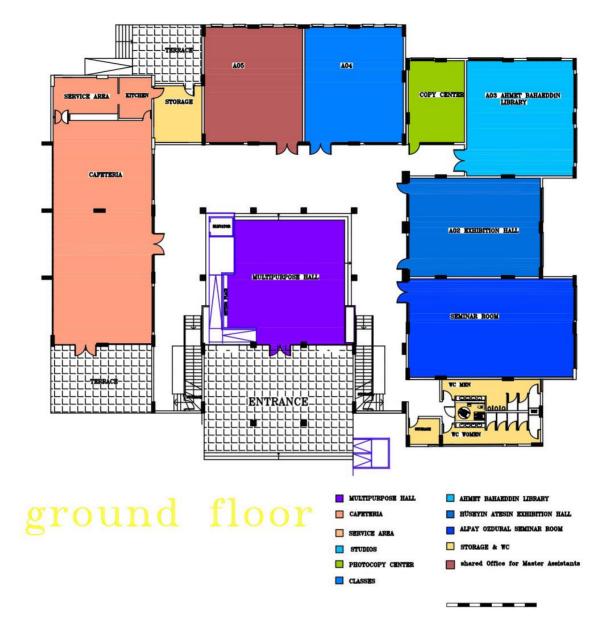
Ground Floor Plan of the Colored Building
